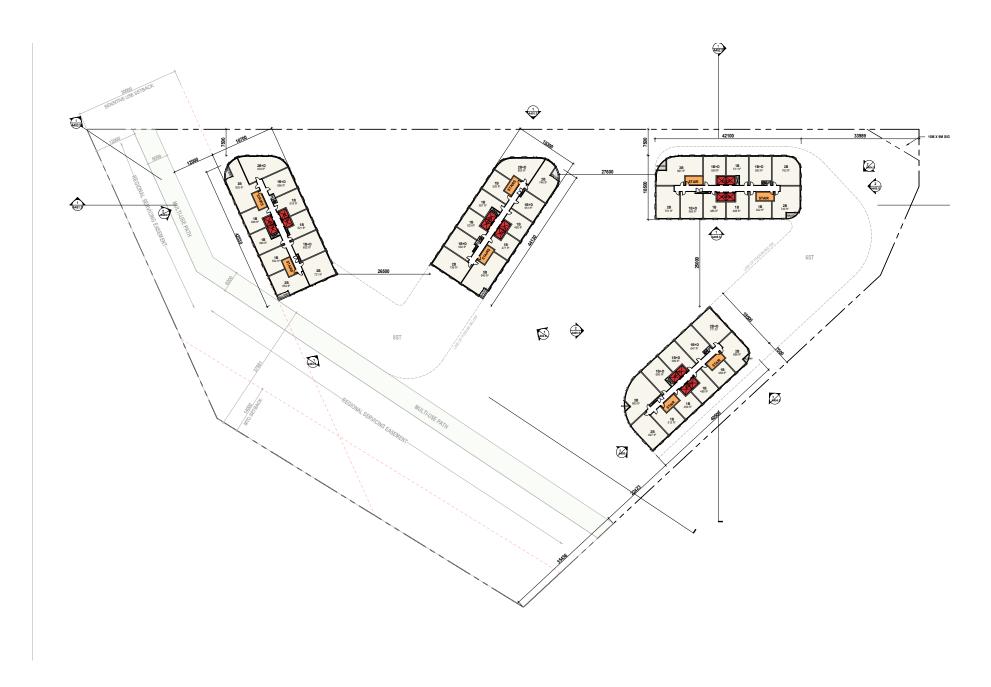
Typical Tower Floor Plan (BDP. QUADRANGLE ARCHITECTS LTD.)
